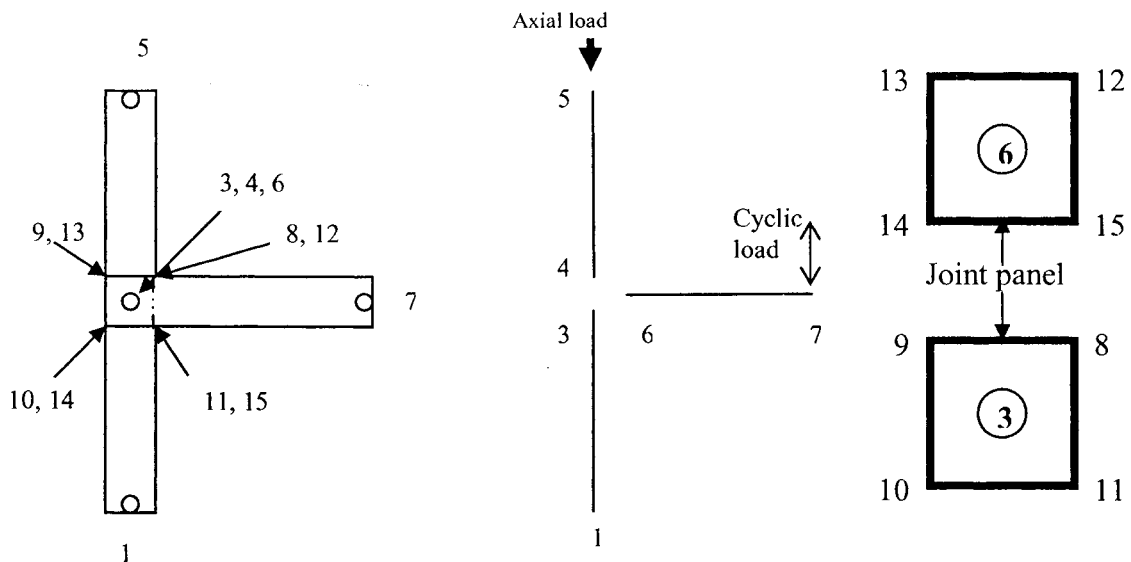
Configuration of the exterior beam column joint in the proposed model
